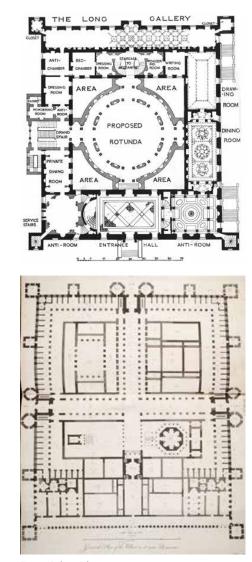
Robert Adam, Plan showing interventions at Syon House 1761-64
